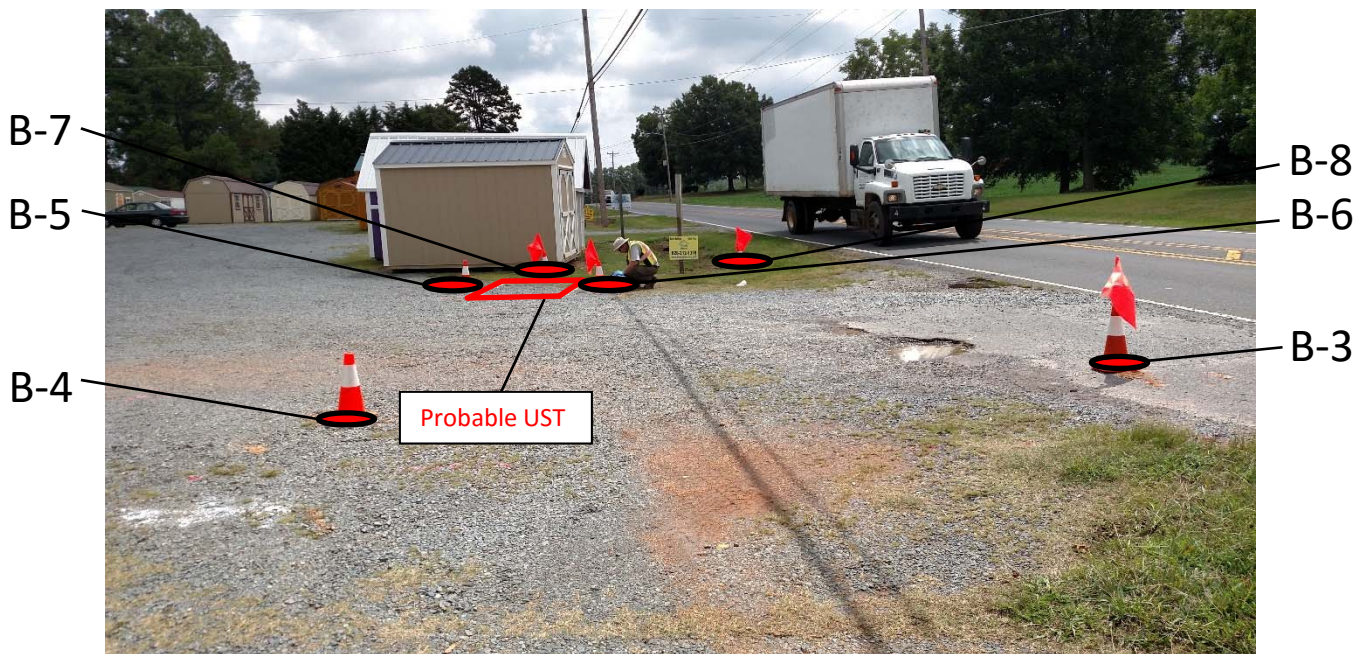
Boring locations B-3 through B-8, and a probable UST located southeast of the automotive detail shop, facing west.
